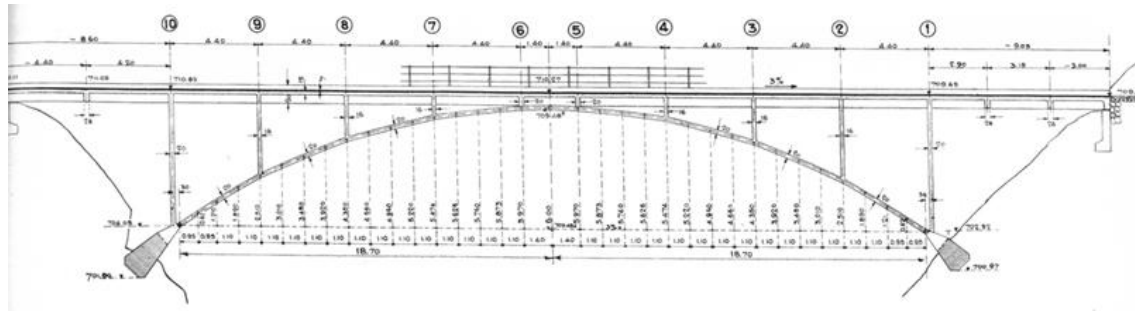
Elevation of the Schwandbach Bridge⁴.
